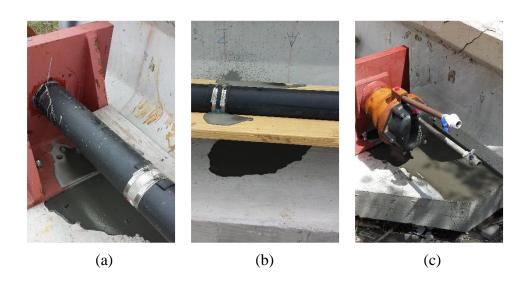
Grout Leakage: (a) Anchorage, (b) Drilled Hole, (c) Anchorage
